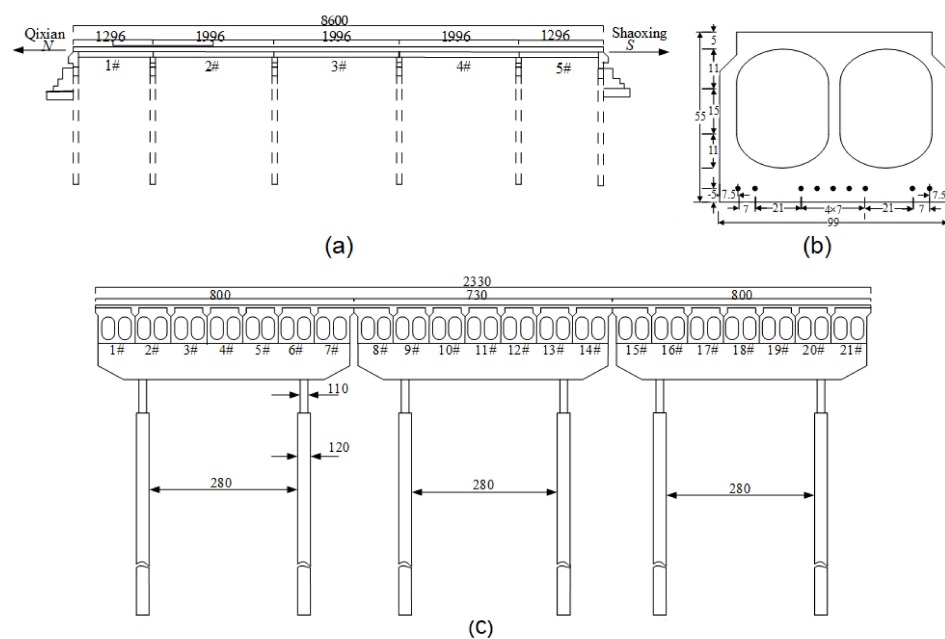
Background bridge (cm). (a) Longitudinal section. (b) Girder section. (c) Transverse section.
